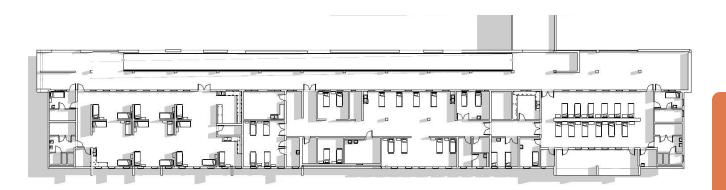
FLOOR PLAN OF MATERNITY BLOCK
